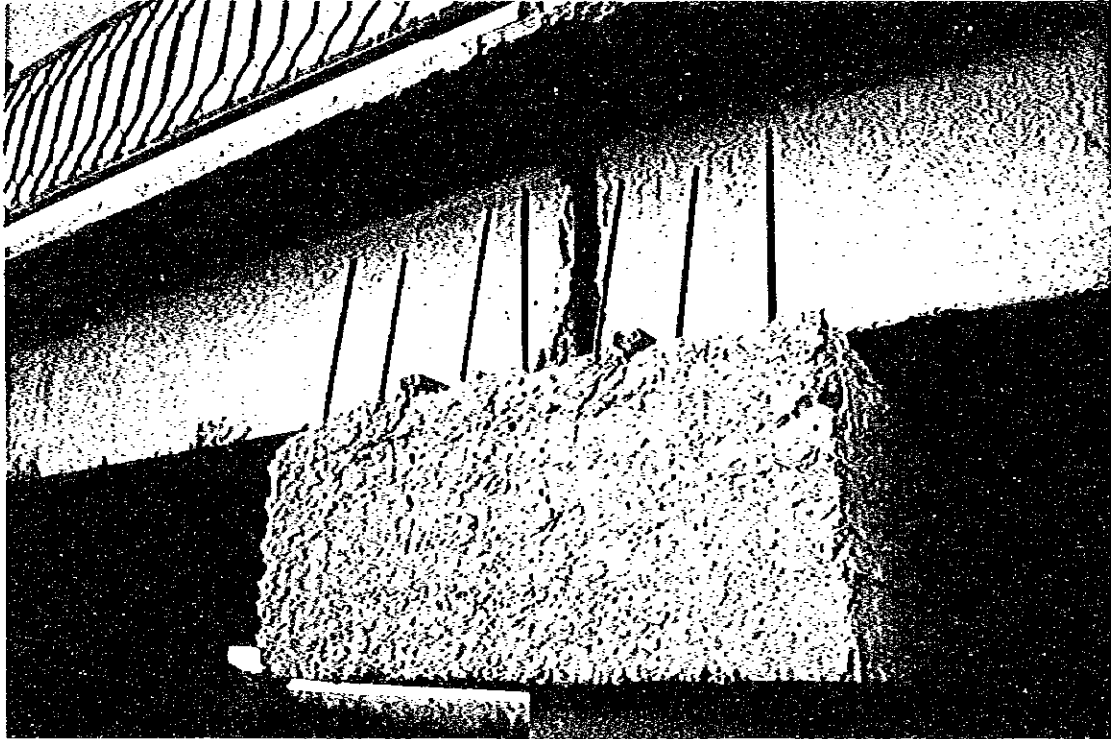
Bridge No.29 on the Karabutak ~ Kzyl Orda Boarder Road Section
